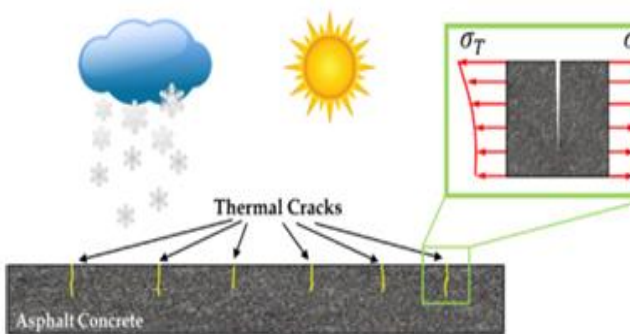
Typical Thermal Cracks in Asphalt Pavement [20].
